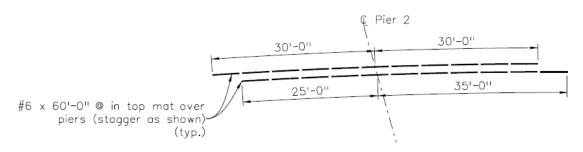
Example 2: Rebar not controlled by concrete dimensions
